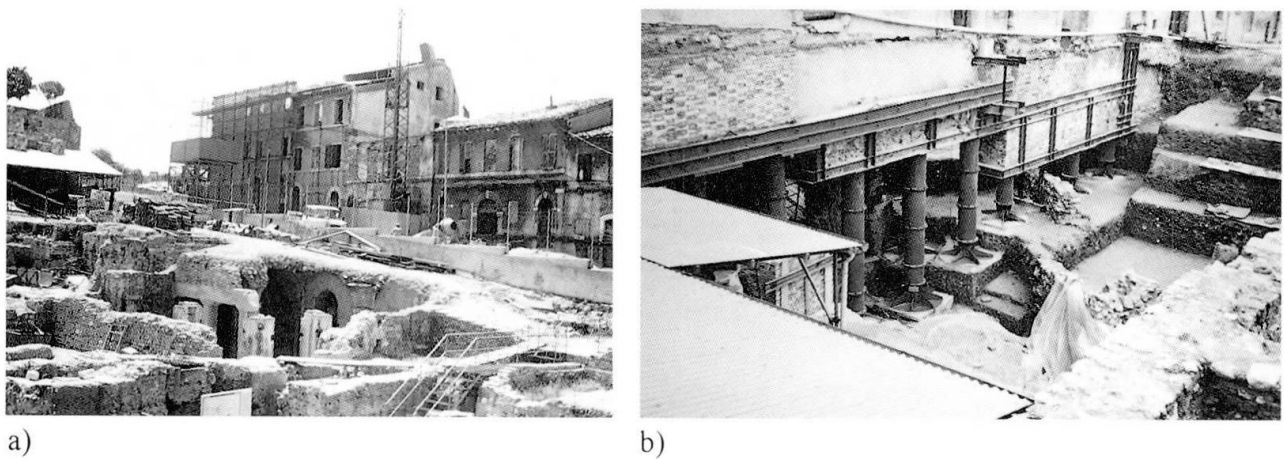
The Amphitheatre of Ancona with houses built above (a) and excavation works under the foundations (b)
